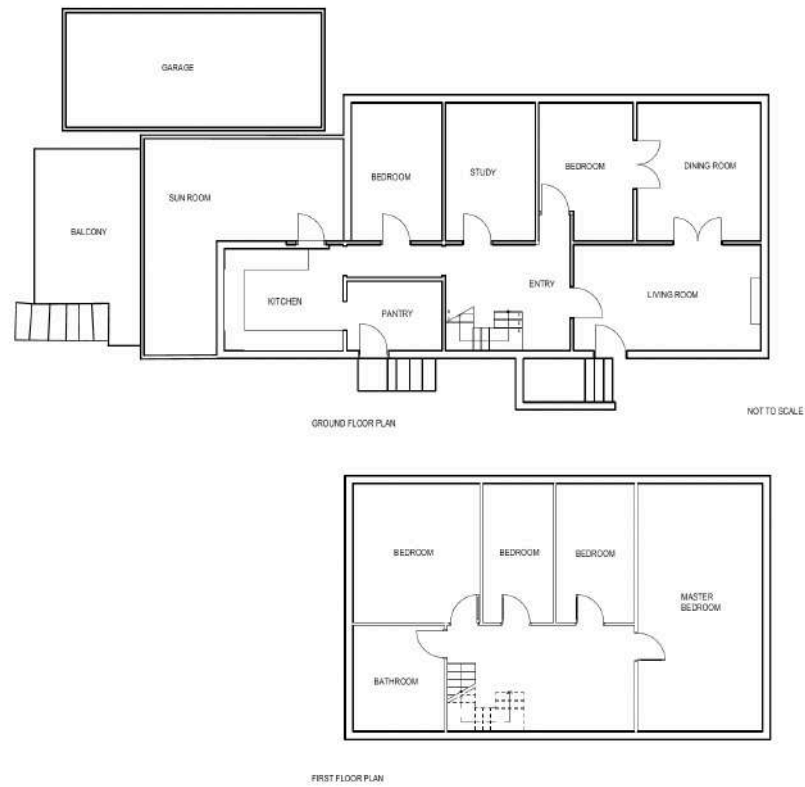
The approximate ground floor and first floor plans of No. 25 Dover Road. Weir Phillips Heritage, 2025.
